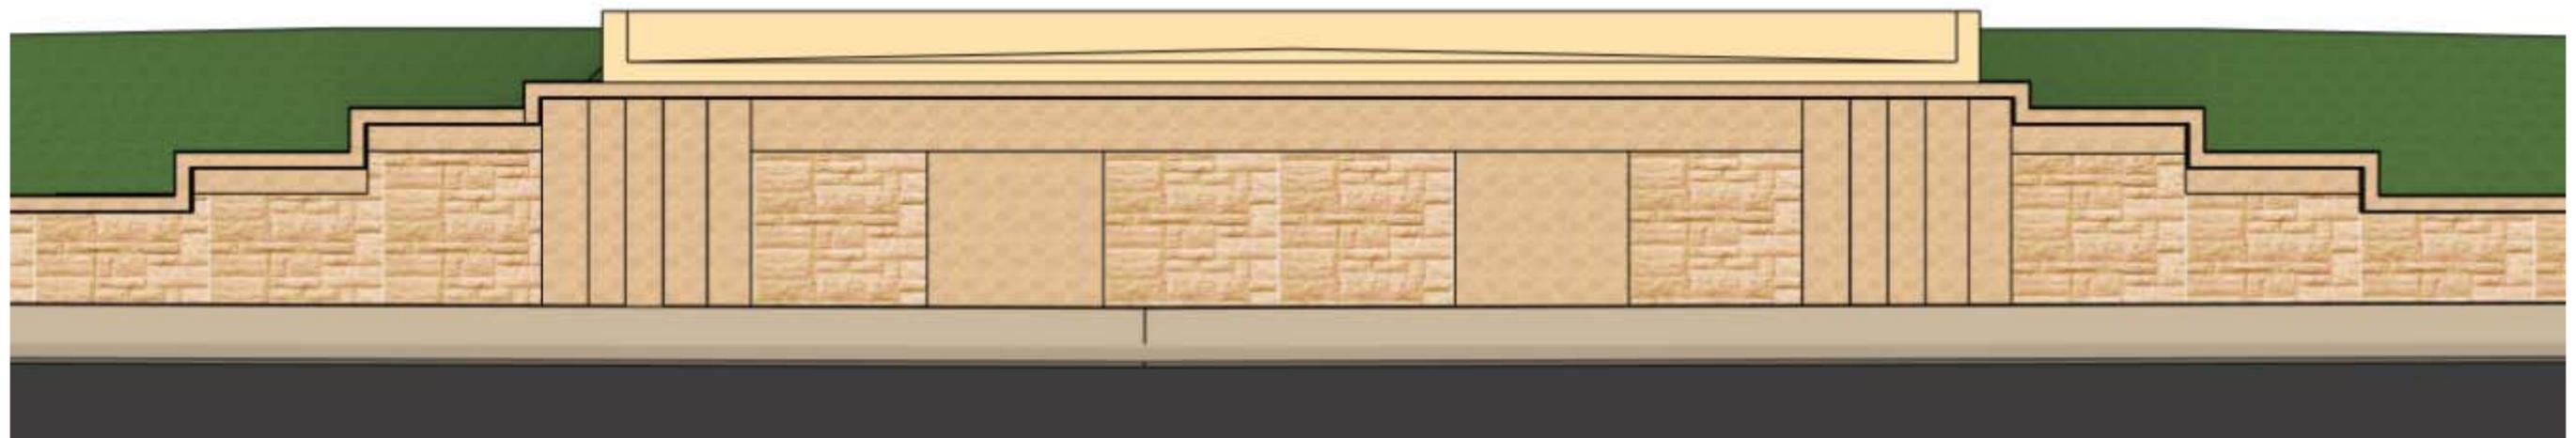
Elevation of Retaining Wall at Cross Street Overpass
